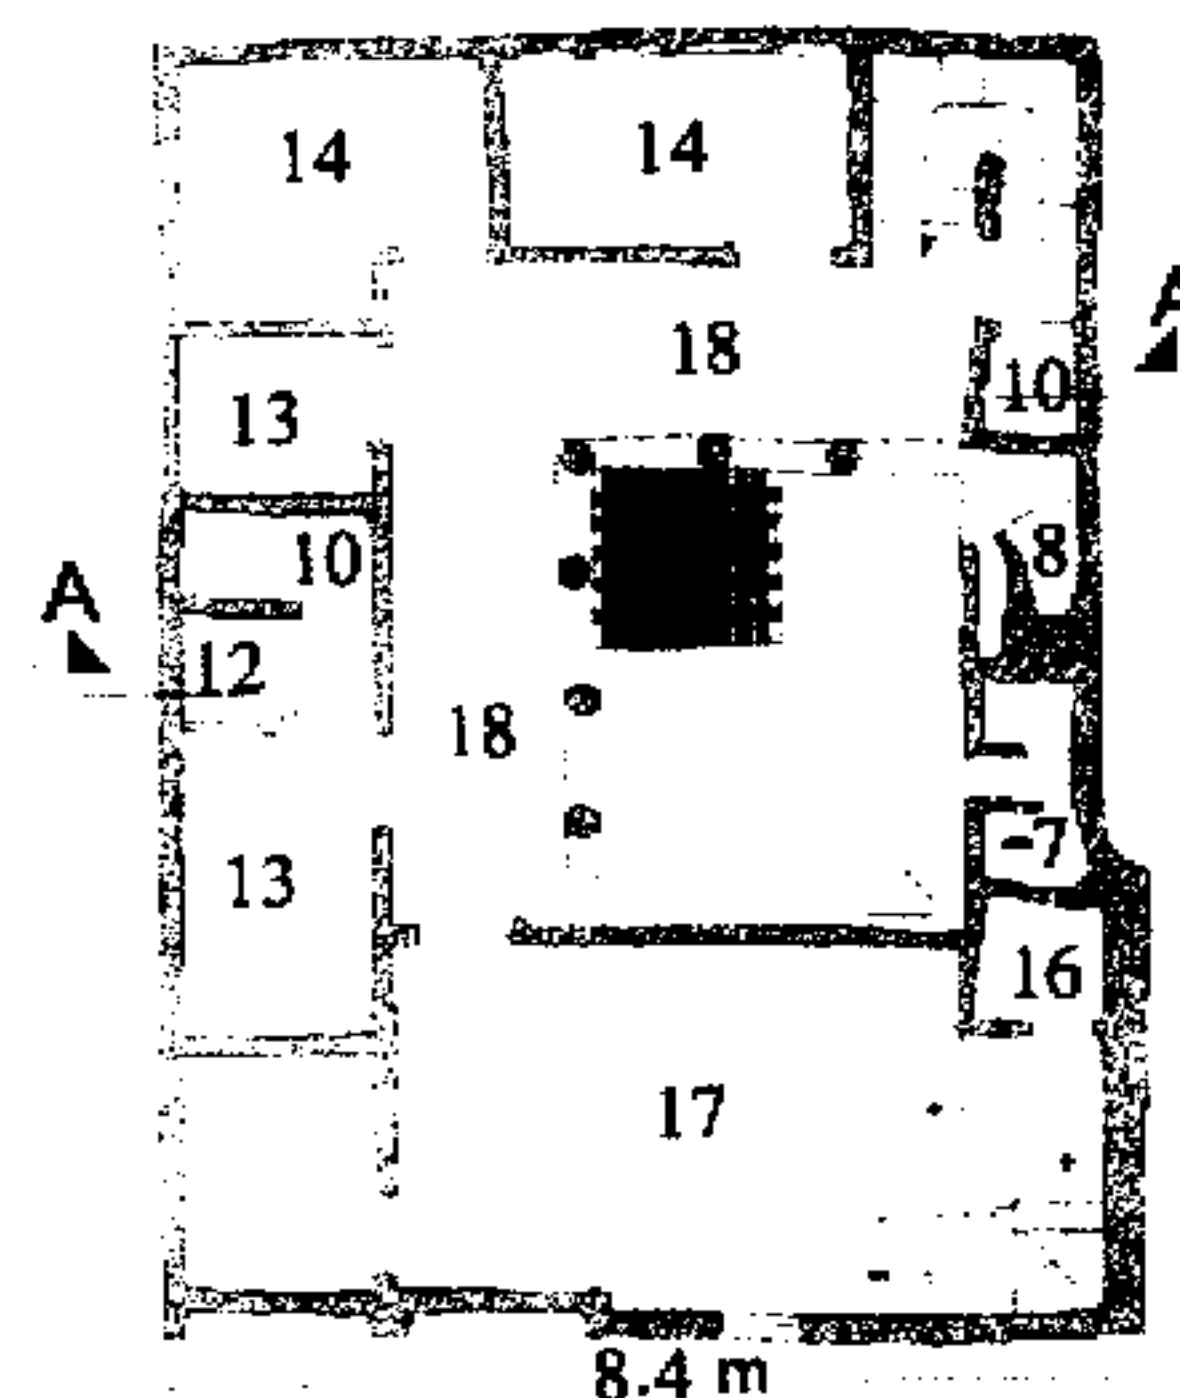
First floor plan of a typical Mزاب dwelling. Legend: 17. Living room for men (*juli*), 18. Porch, 19. Courtyard top opening (*shebek*).
